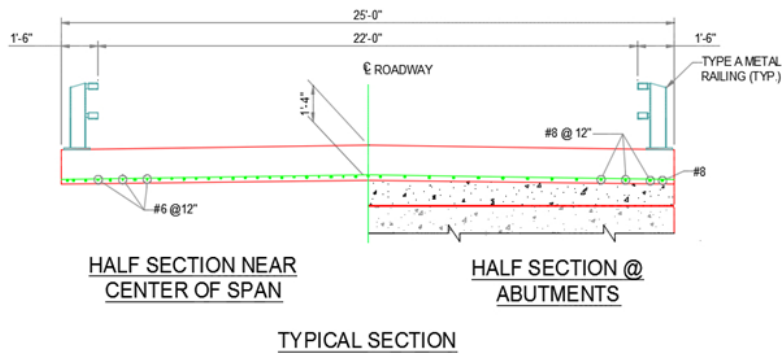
Structure plan of Bridge 8676 (as-built drawing).
